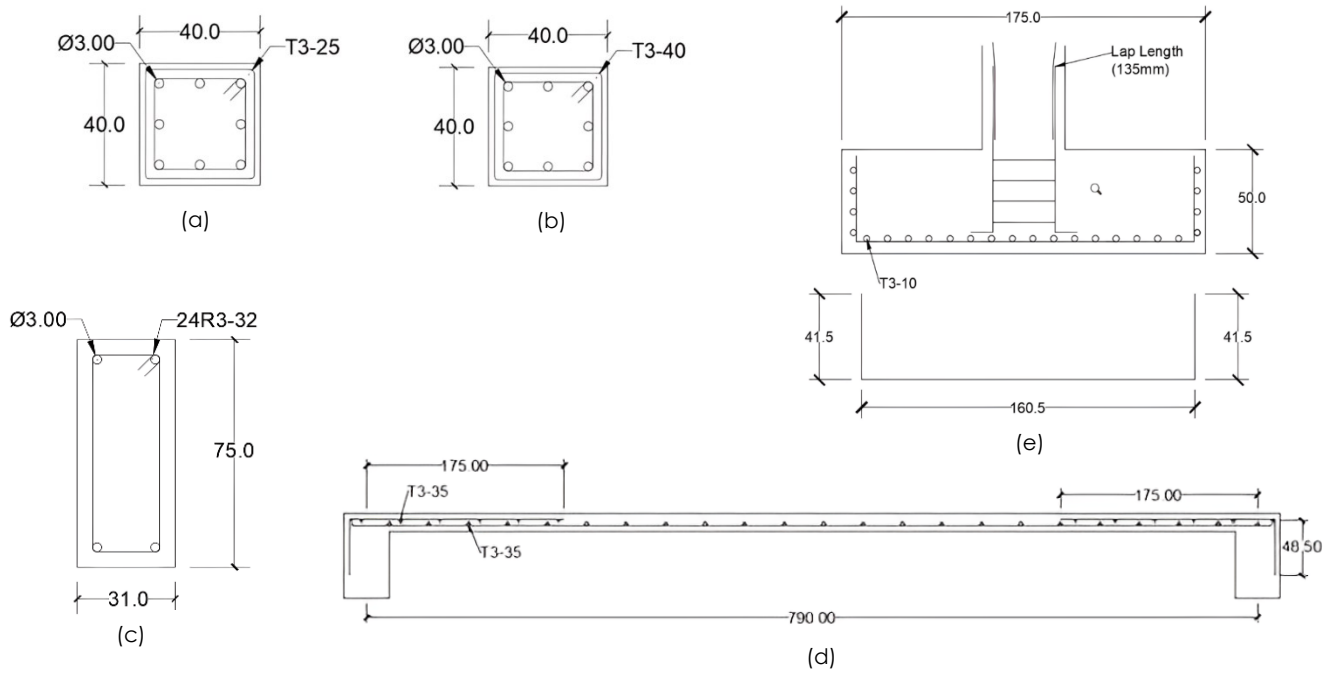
Detailing of (a) Column for Third and Second Floor, (b) Column for First Floor, (c) Beam, (d) Slab & (e) Footing
